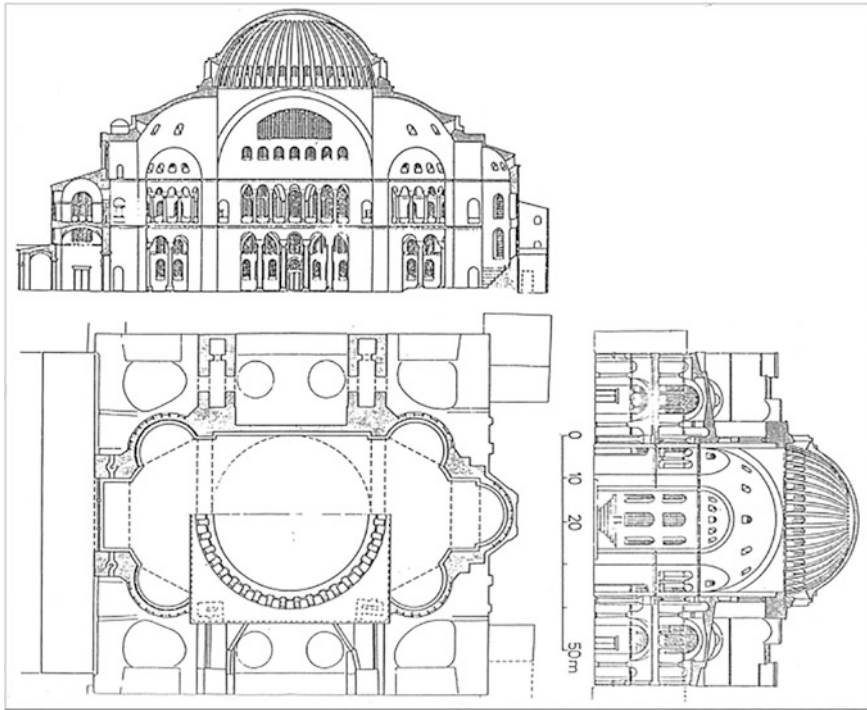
Plan and N-S and E-W section views (after Van Nice 1965)
